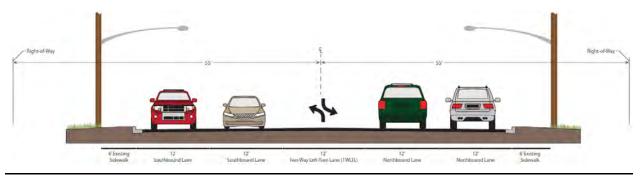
Existing Typical Section – Segment 4 (NE Riddell Road to NE Furneys Lane)
